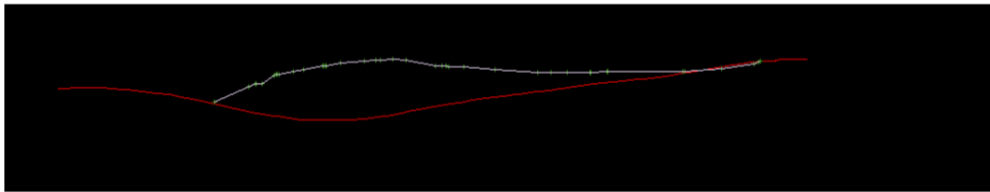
Outlining a general arrangement of the landforming of the construction pad site
